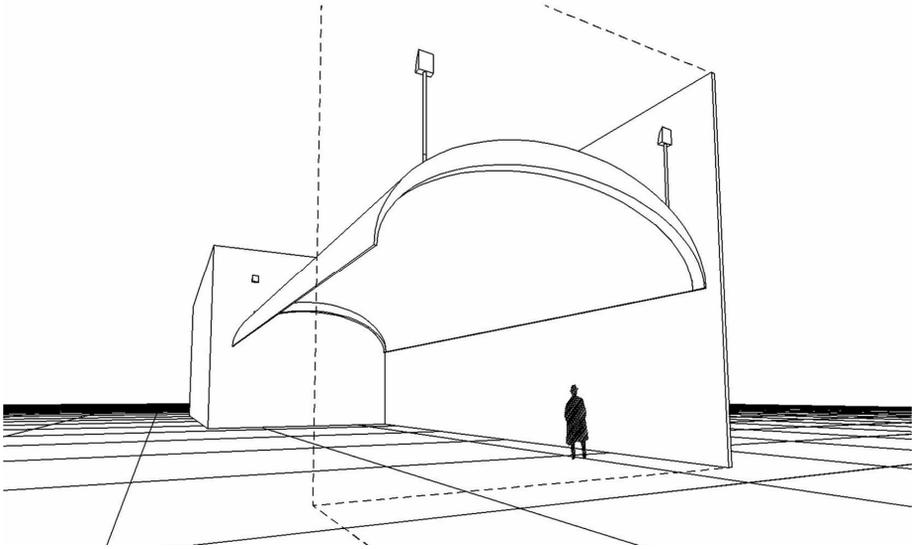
View of the roof of the Escuela Elemental de Trabajo. The cables from which the shell was suspended can be seen.
